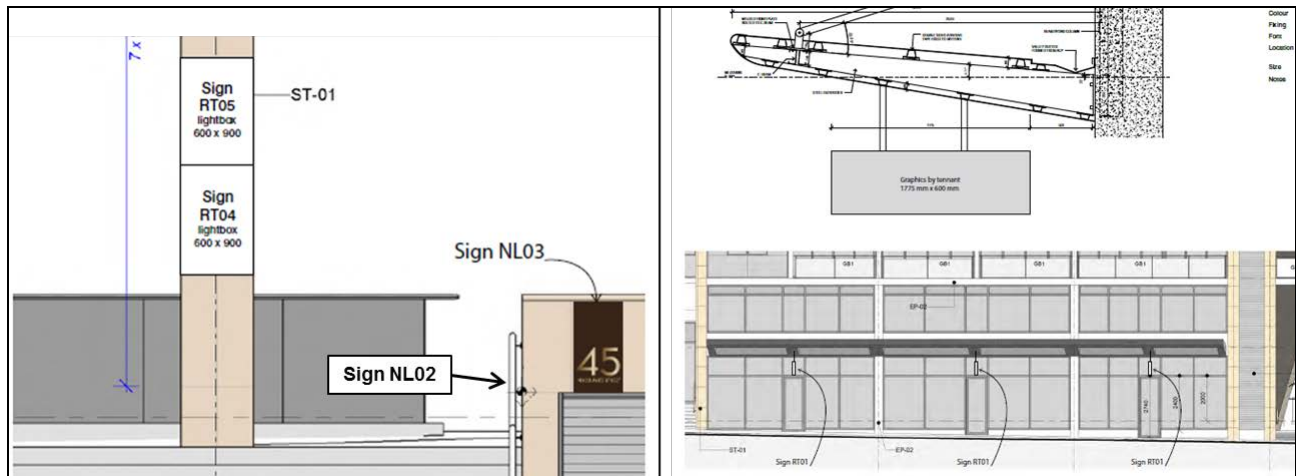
Support column mounted retail box signage zones (left) and hanging retail box signage zones (right) (Source: proponent's RtS)
